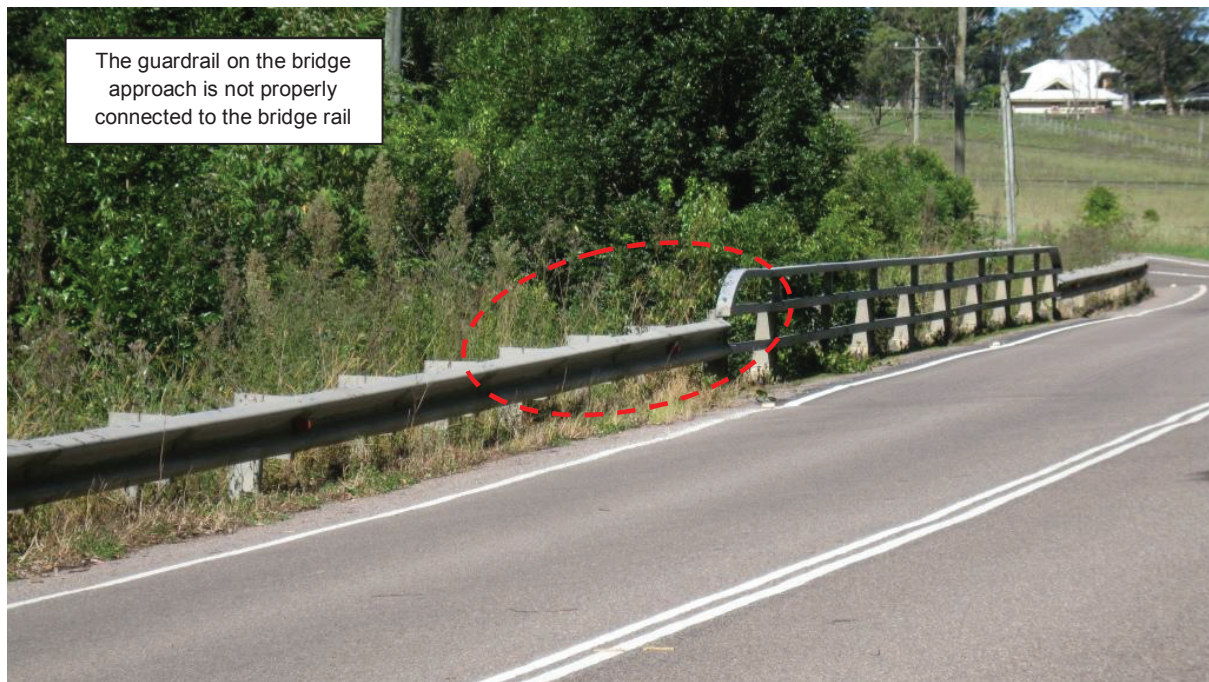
Jilliby Road, looking south toward the Flacks Bridge
